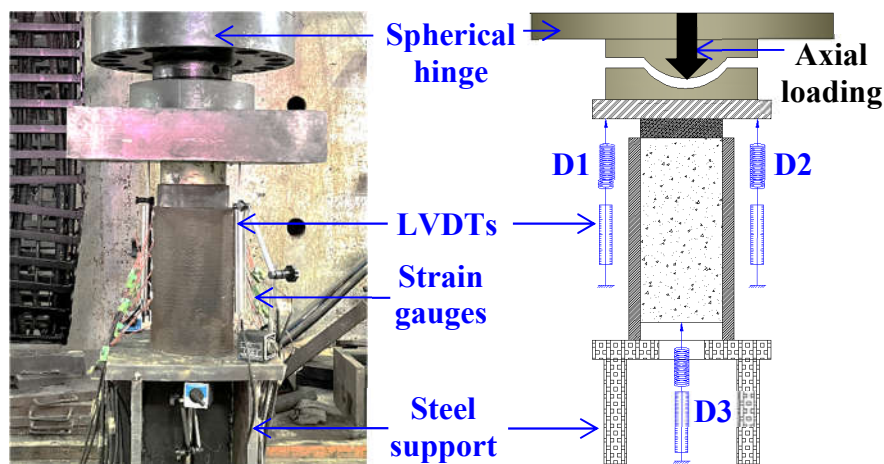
Test setup of axial compressive tests on push-out CFST specimens
